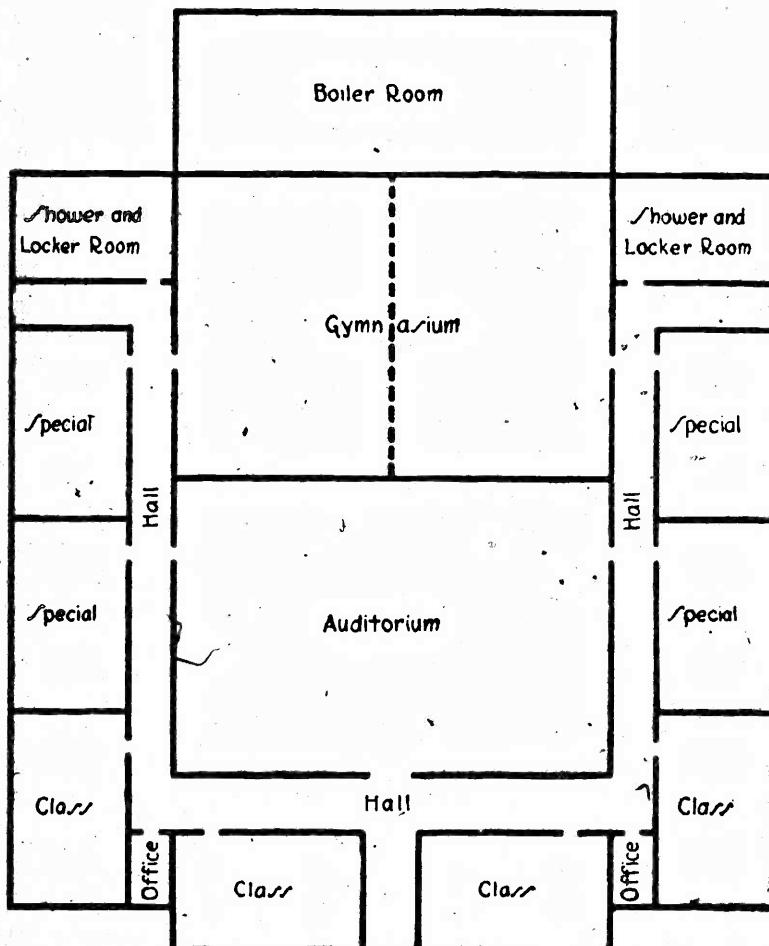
EXHIBIT C.—Suggested addition for Oconee School. This plan, with the addition of two rooms, is also applicable for Baxter School.
